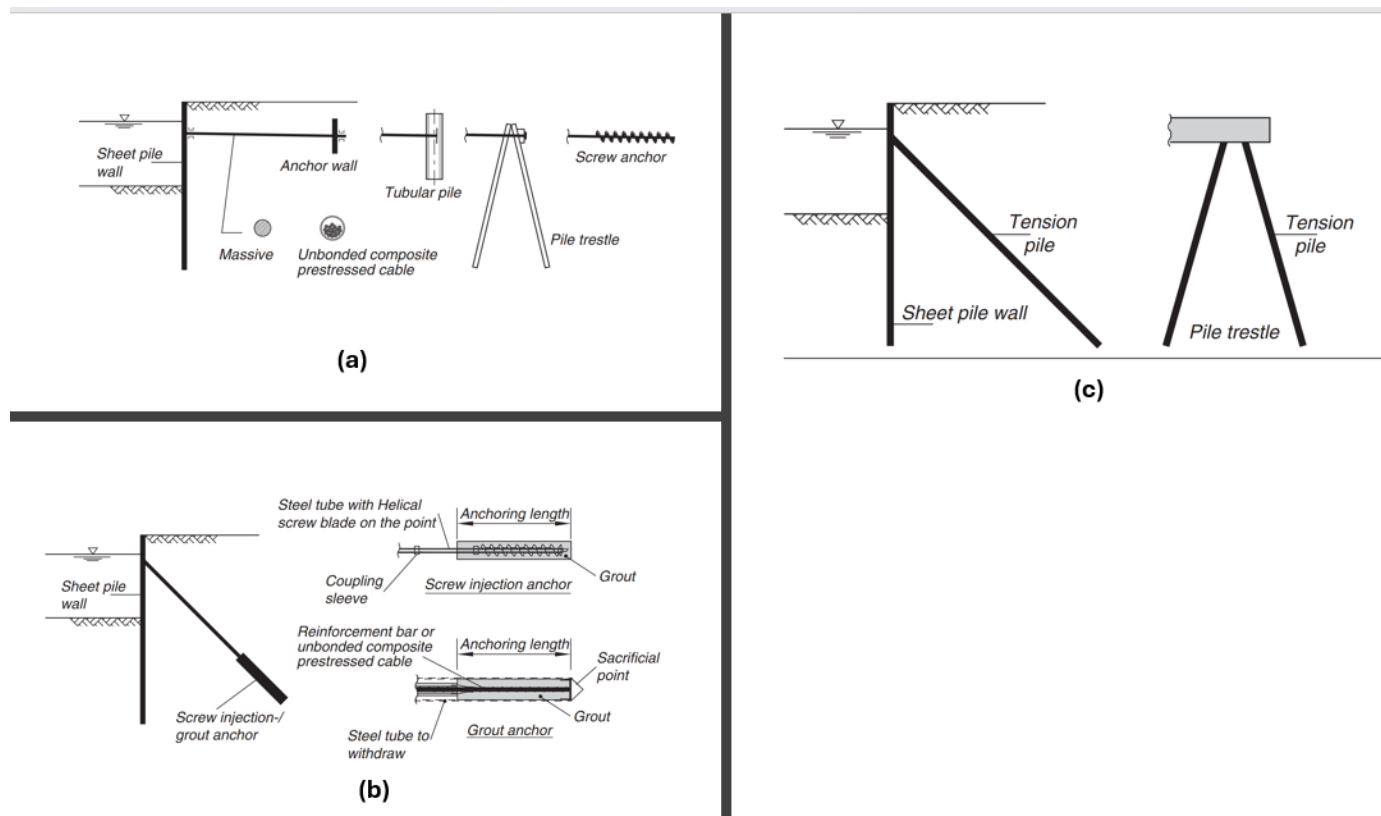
Types of Quay walls: (a) Horizontal Anchorage, (b) Anchorage with a Grout Body, (c) Tension Piles [10]
